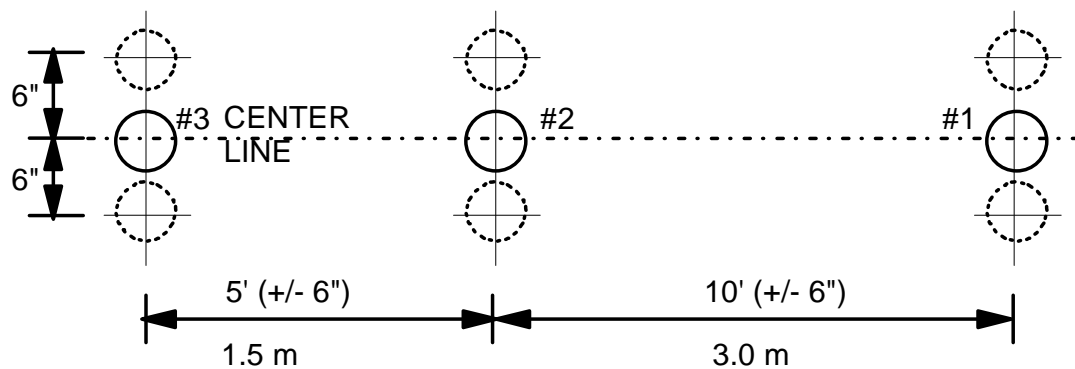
Plan View of Cased Boreholes for Crosshole Seismic Testing
